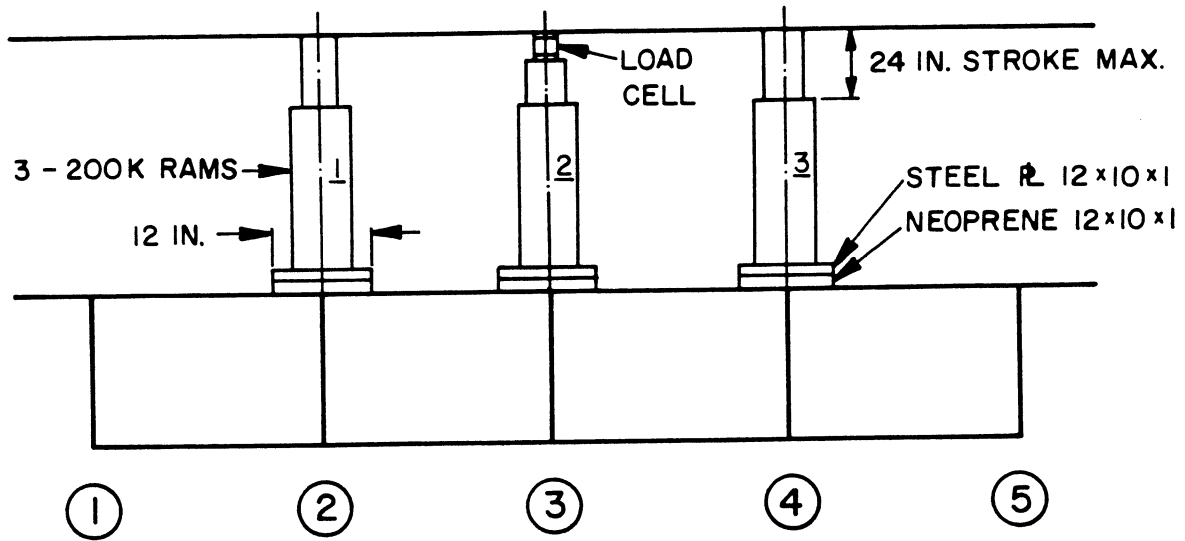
LOAD ARRANGEMENT AT MIDSPANS I AND II FOR FINAL LOADING TO FAILURE.
